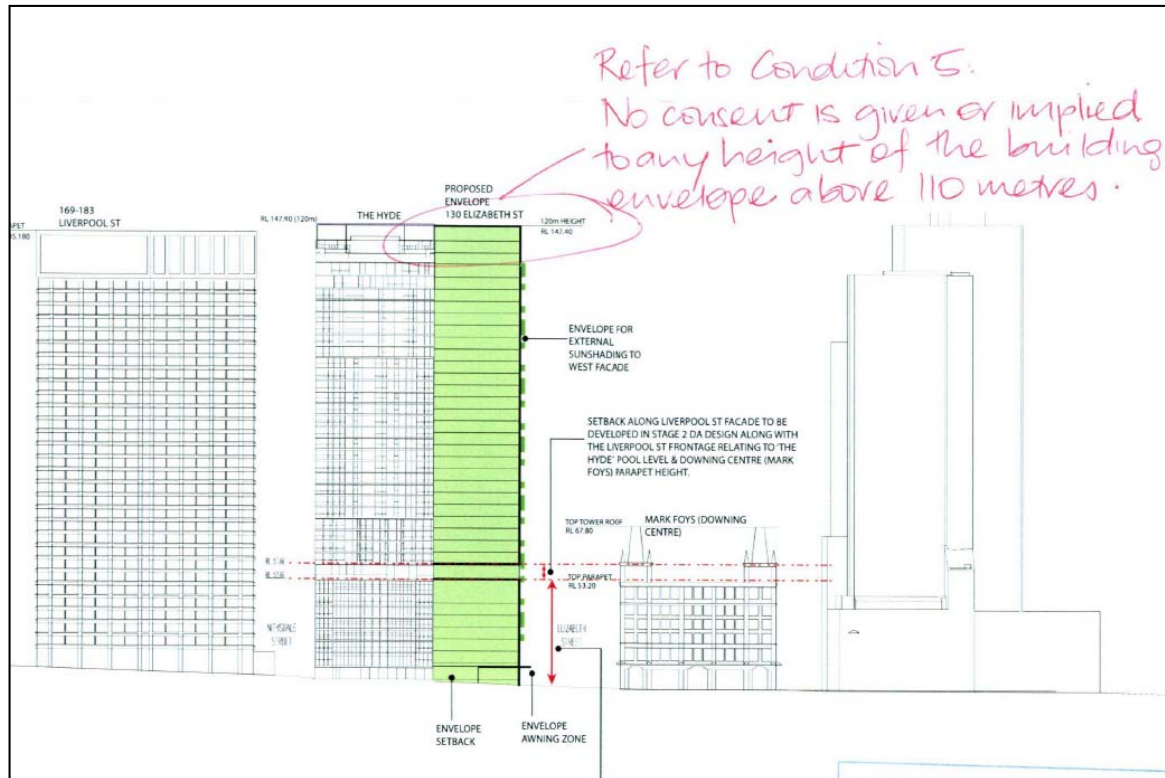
The Stage 1 building envelope for the site as viewed from Liverpool Street, illustrated at a height of RL 147.4 (or approximately 122 metres)
